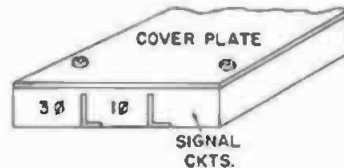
B. Metal gutter used for power wiring and control circuits.
